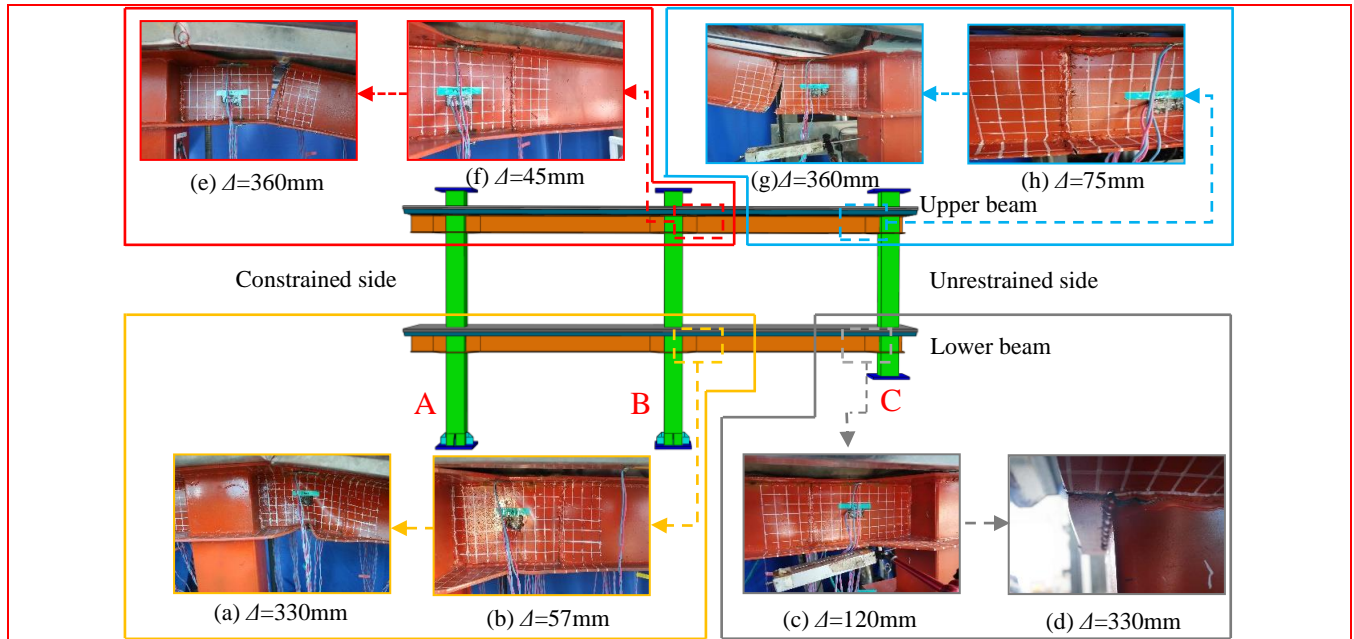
Local failure modes of steel beams (SF-1)
